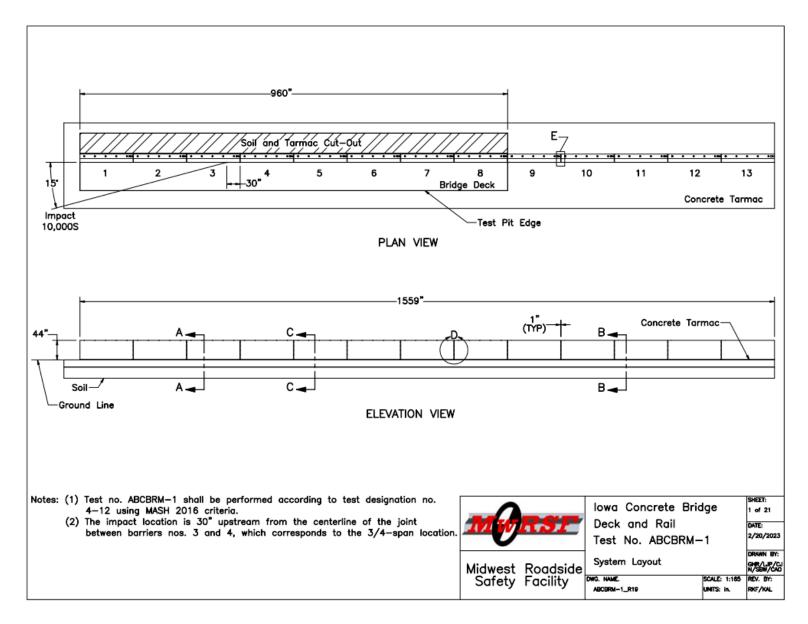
Iowa Concrete Bridge Deck and Rail System Layout, Test No. ABCBRM-1
